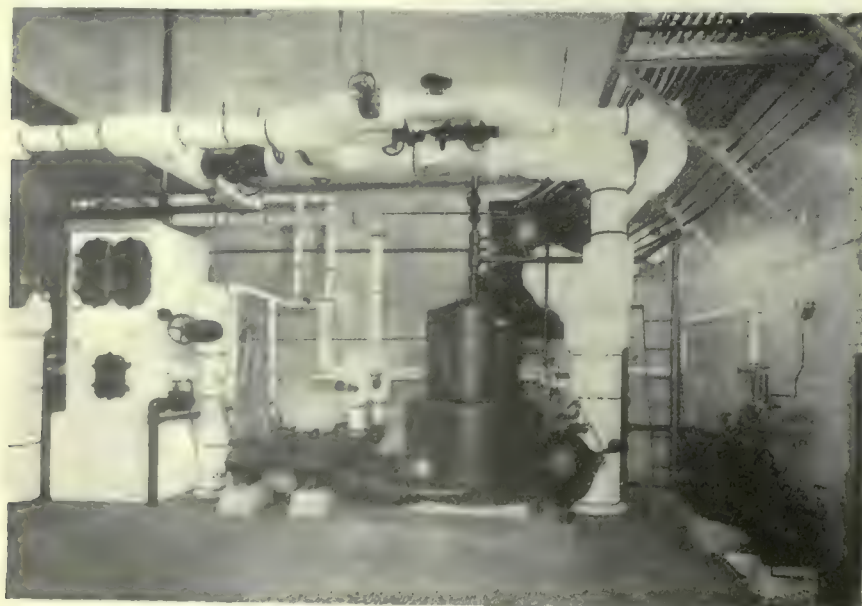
AUXILIARY EQUIPMENT IN ENGINE ROOM.
